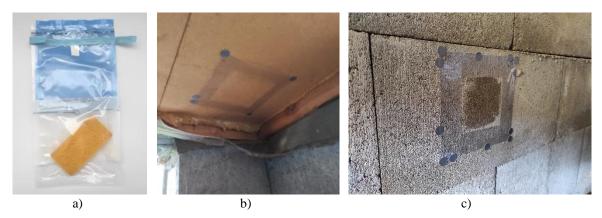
a) Sponge, b) crawl space ceiling sampling template, c) crawl space foundation concrete wall.
